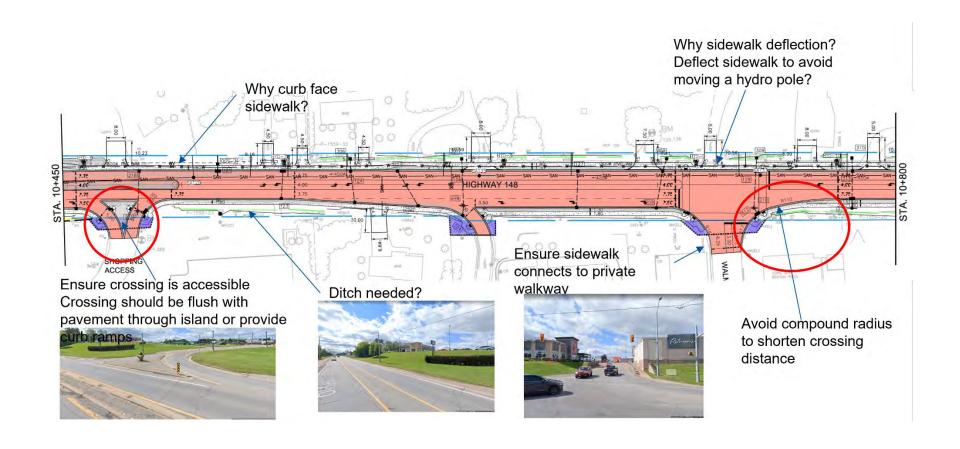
MALL ENTRANCE TO WALMART INTERSECTION REVIEW AREAS
